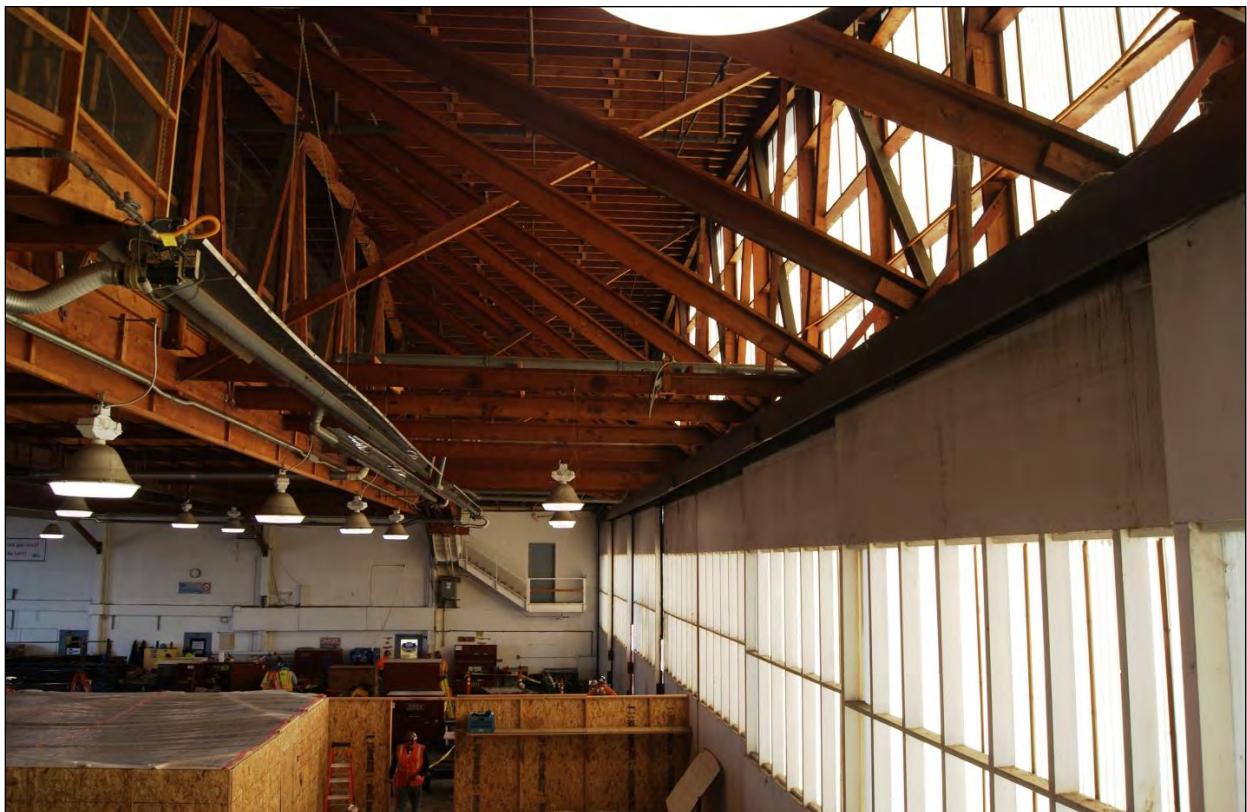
The south wall doors, transom, and the loft to the left; the view is towards the east.
